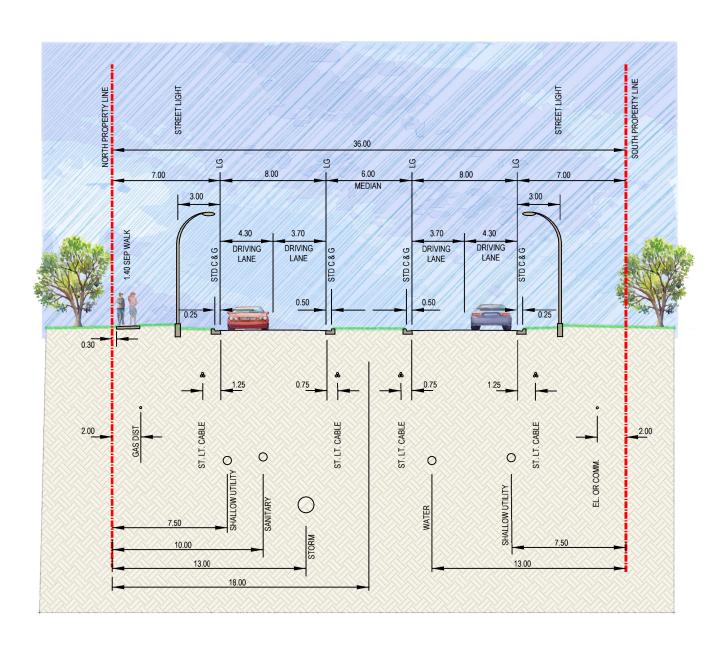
ROAD SECTION NOSE CREEK BOULEVARD
